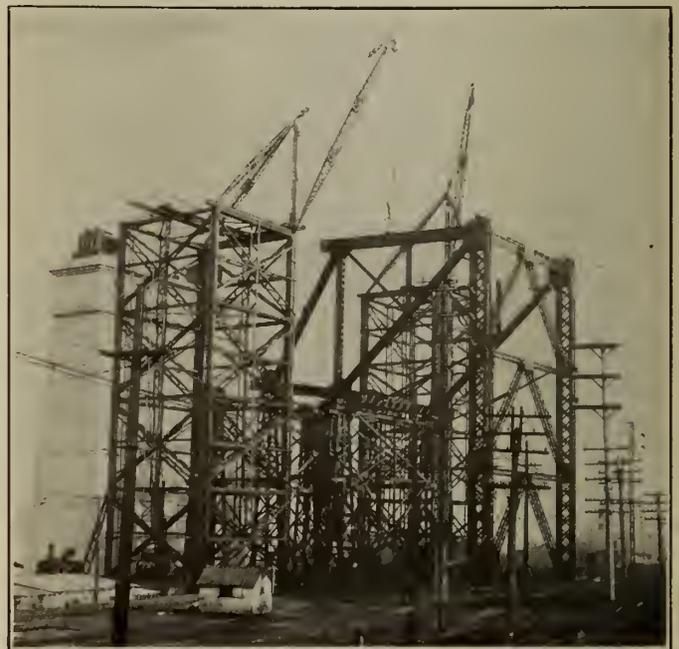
Main Span, North Side—Erection of Falsework Span and Tower—First Stage.
